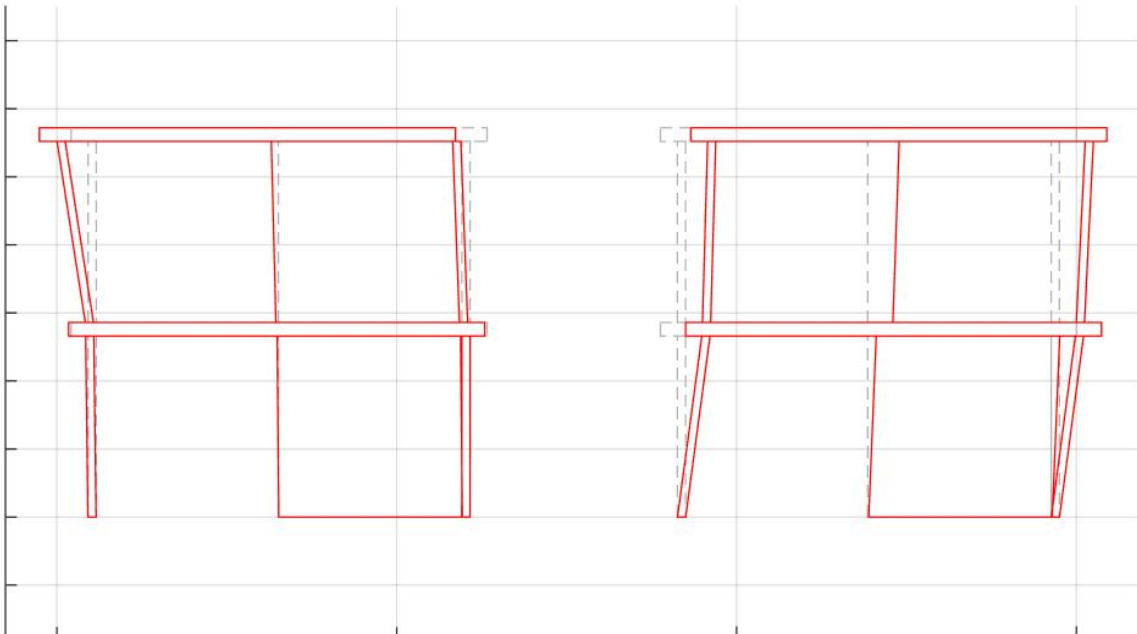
Deformed shape of EUC-BUILD4 specimen (max and min) – Test run #4.
